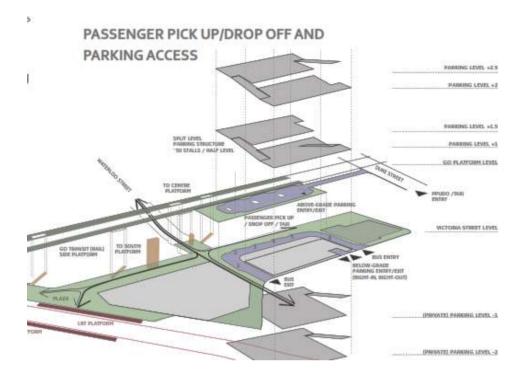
passenger pick-up/drop-off and parking access of King-Victoria Station
